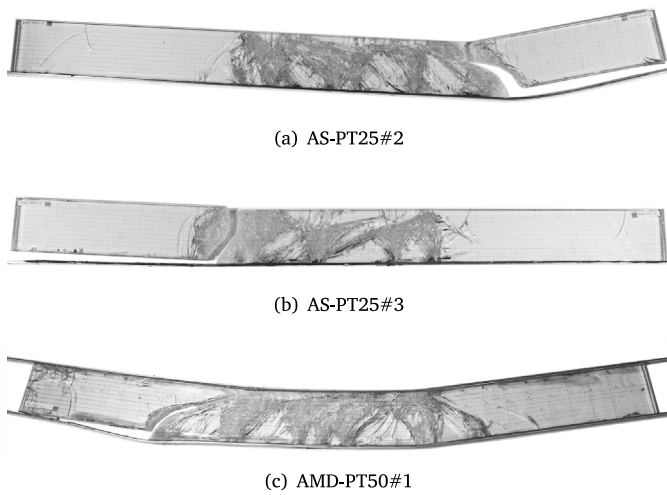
Post-tensioned glass beam specimens after ultimate shear failure.
